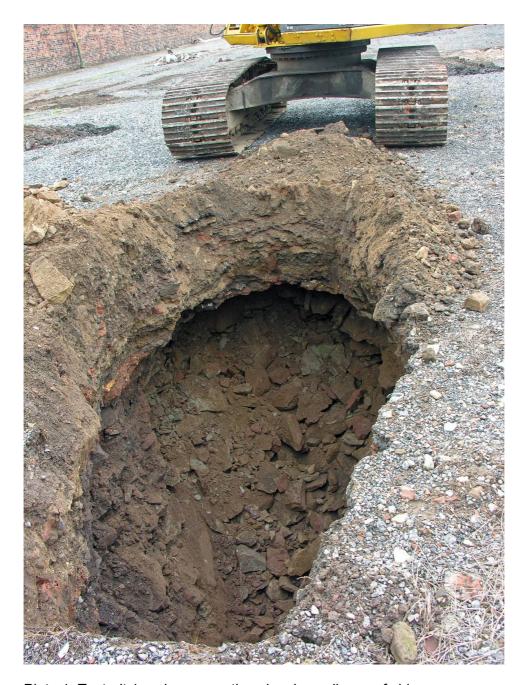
Test-pit 1 under excavation showing collapse of sides.
